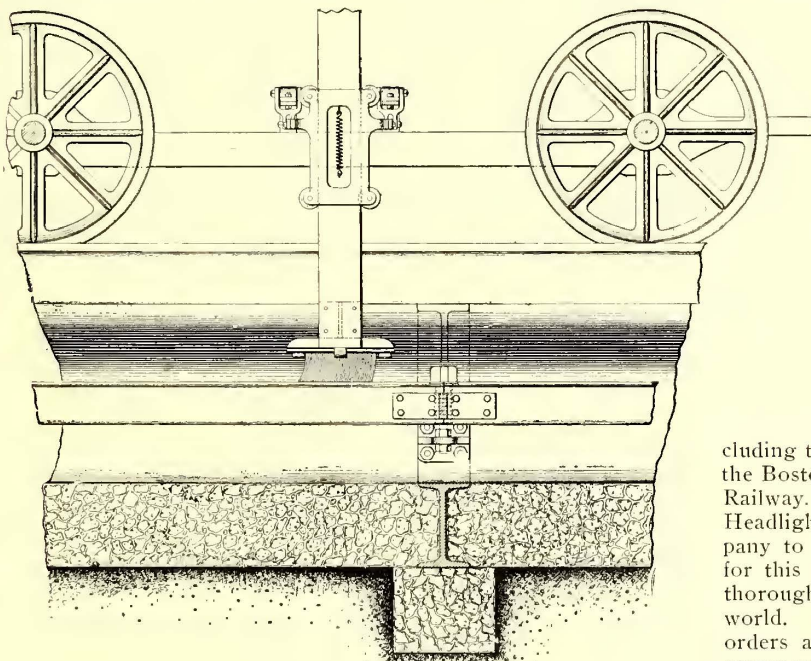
SIDE ELEVATION THROUGH CONDUIT
